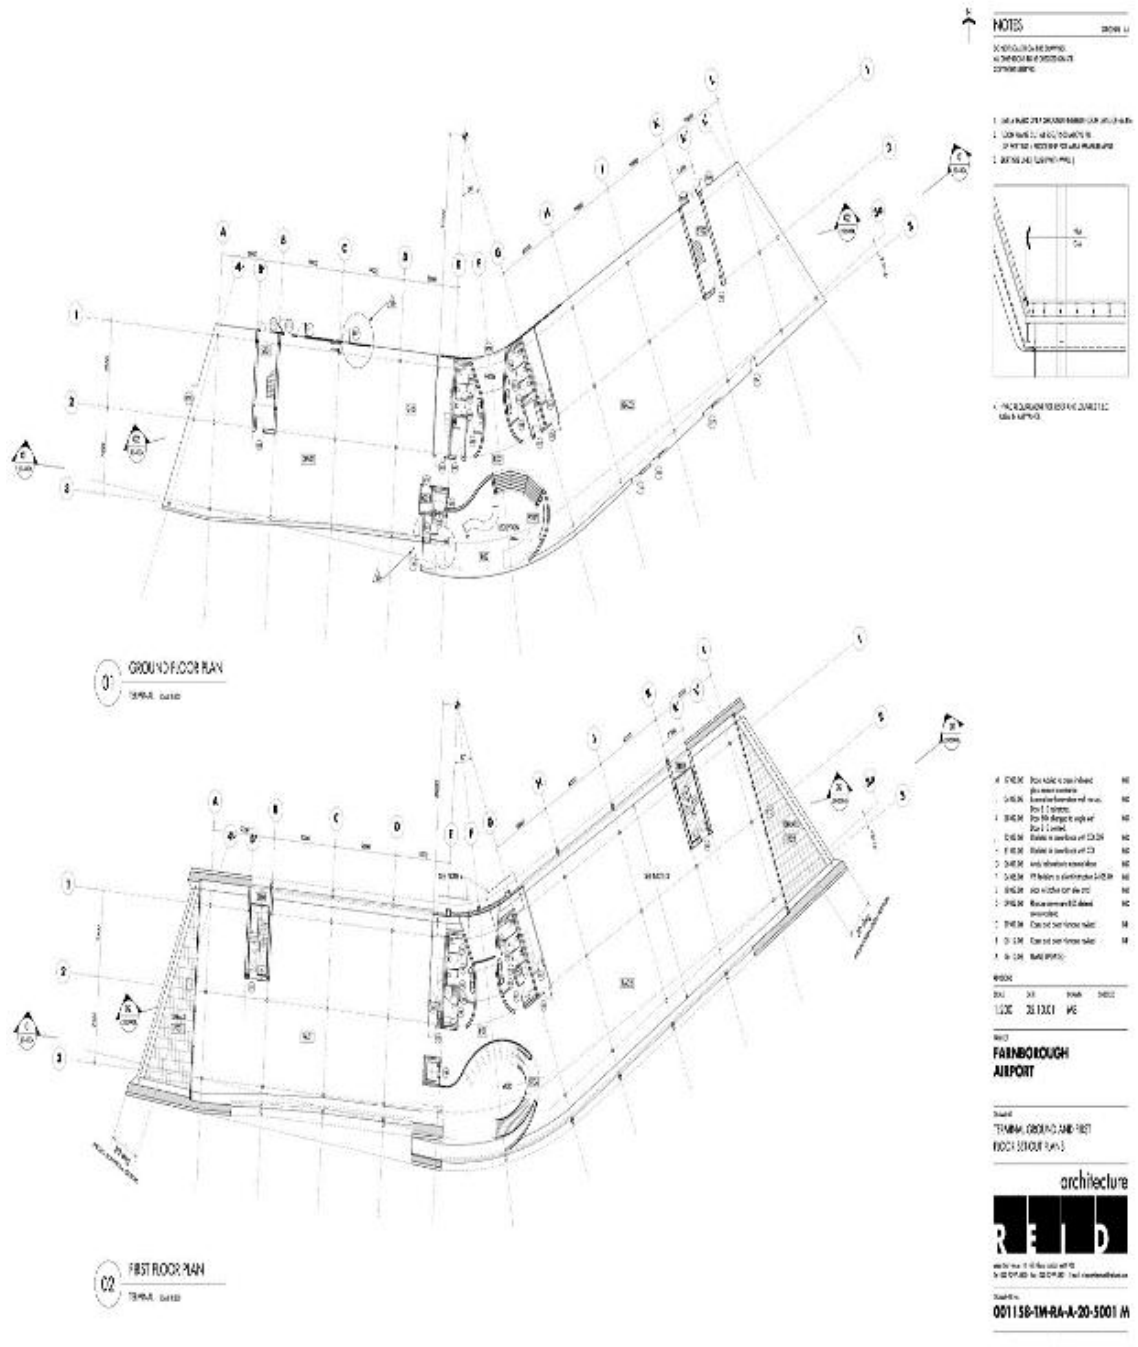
3: TAG Farnborough Airport Terminal Building Floor plans
